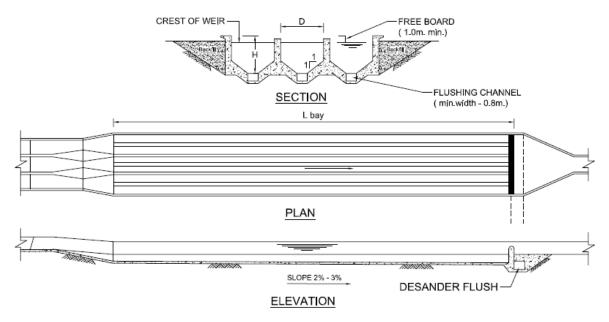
Typical Section, Plan and Elevation of the Desanding Basin
